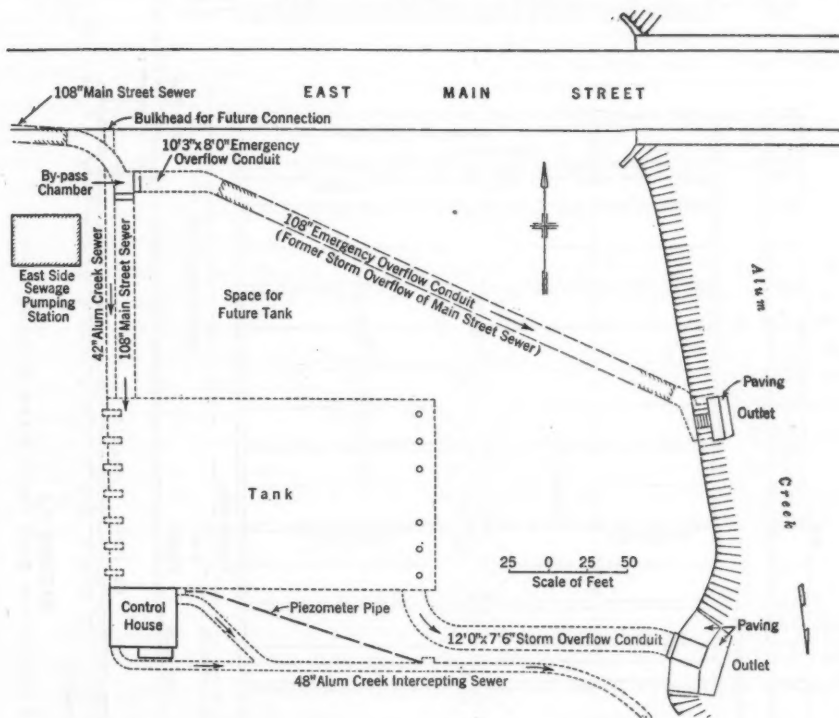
PLAN OF ALUM CREEK STORM STAND-BY TANK, COLUMBUS, OHIO.
